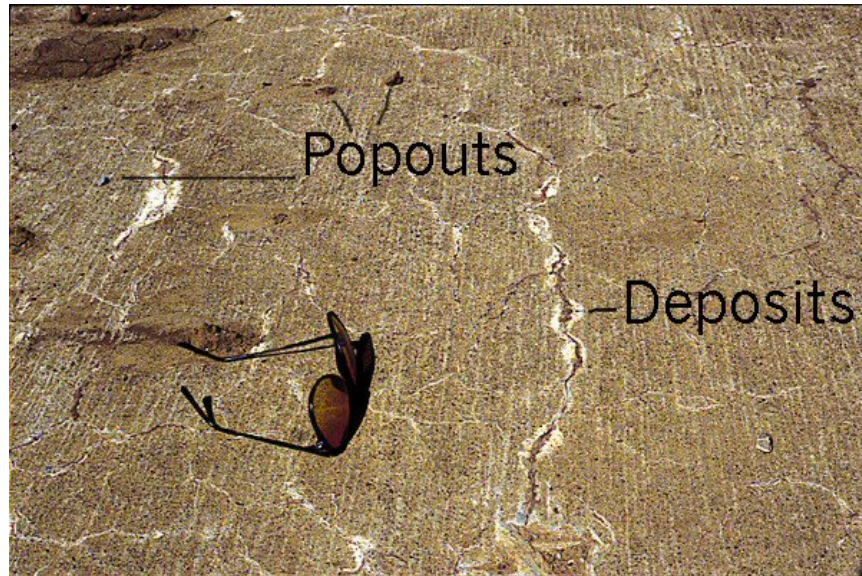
ASR-induced Cracking in Taxiway at Channel Island ANG Facility. Note cracks are preferentially longitudinal and continue across transverse joints.
